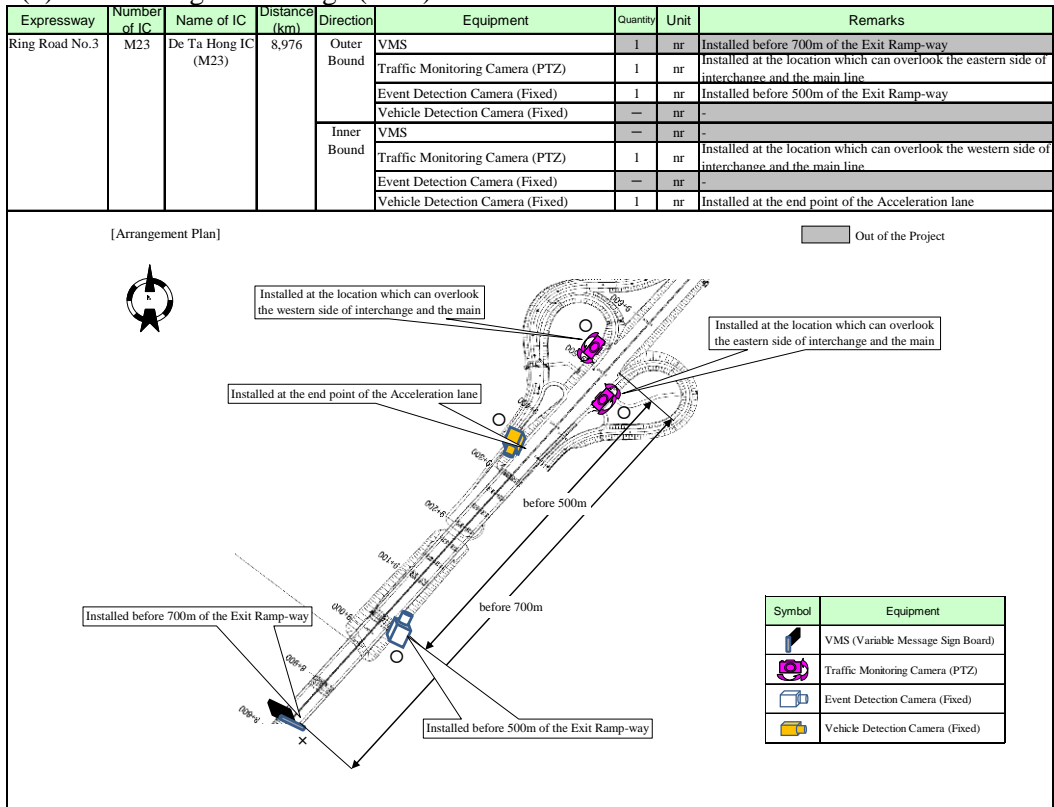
Equipment Layout Plan at De Ta Hong Interchange (M23)
